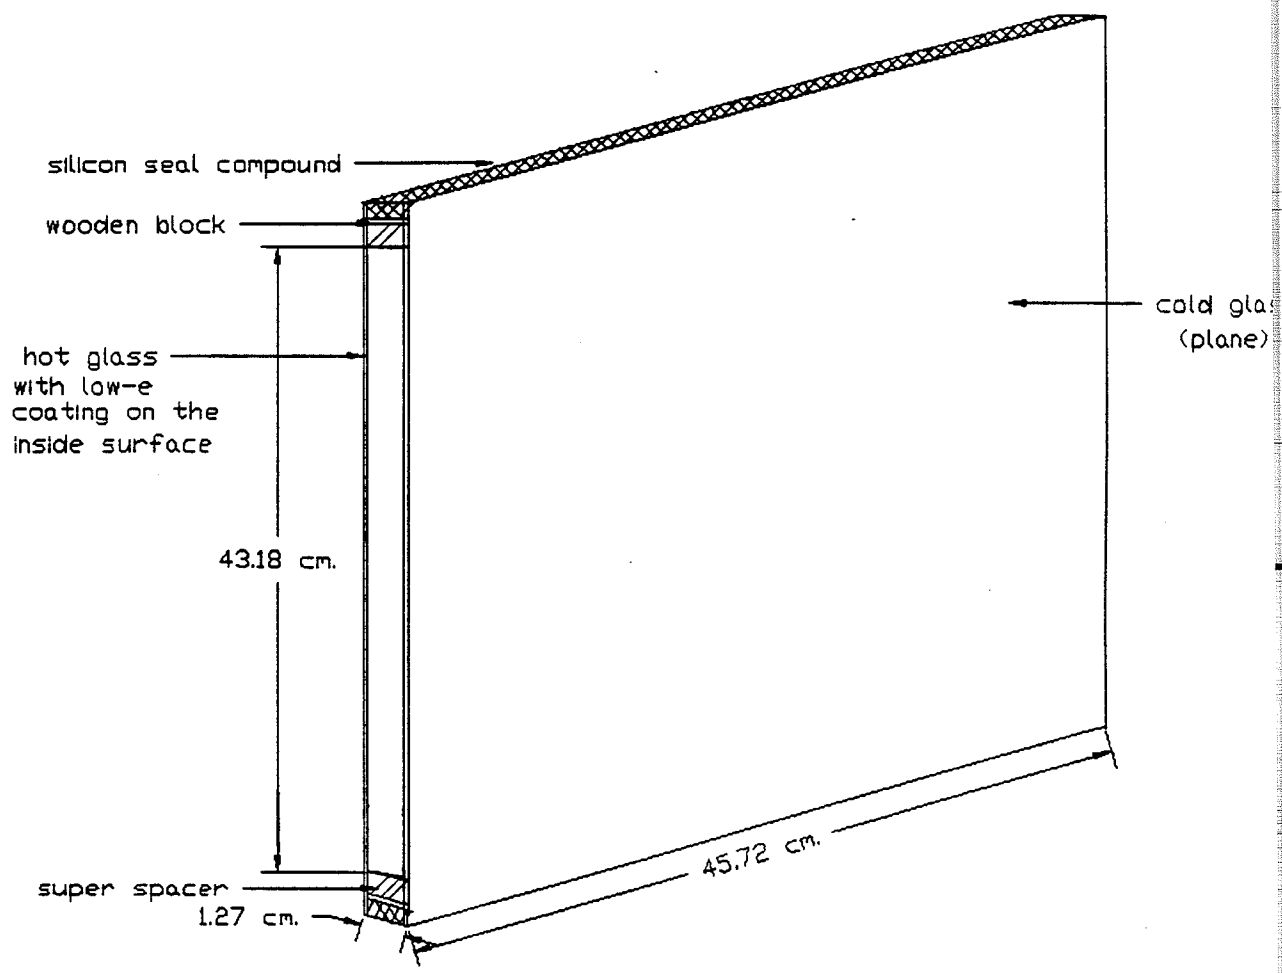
Double Window Glazing Assembly Without Suppressor
